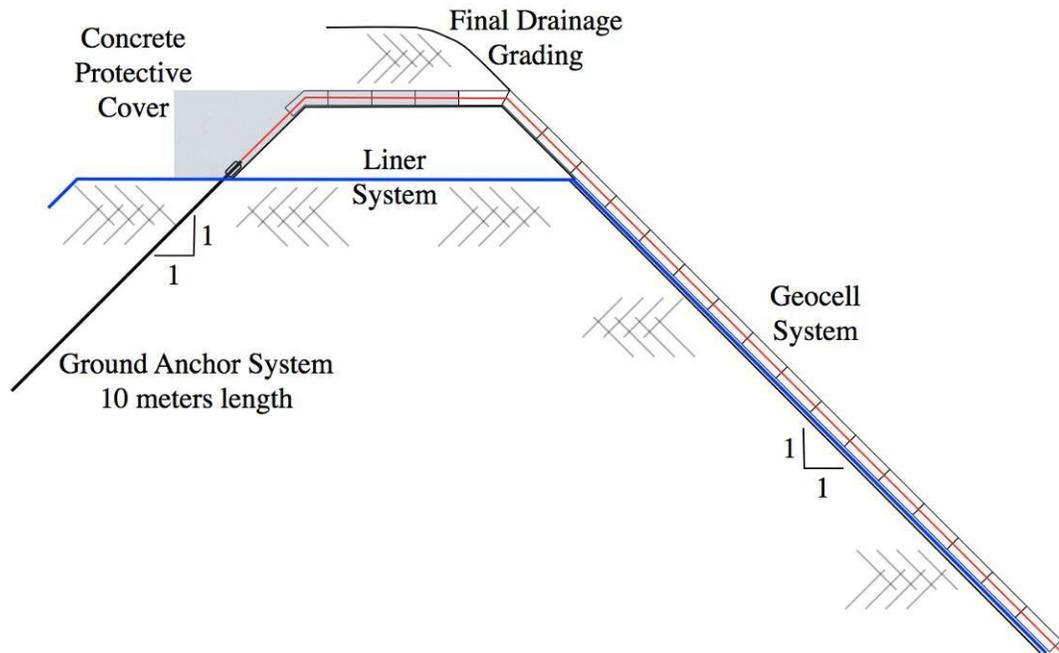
Cross section of the slope protection scheme for long steep slopes.
